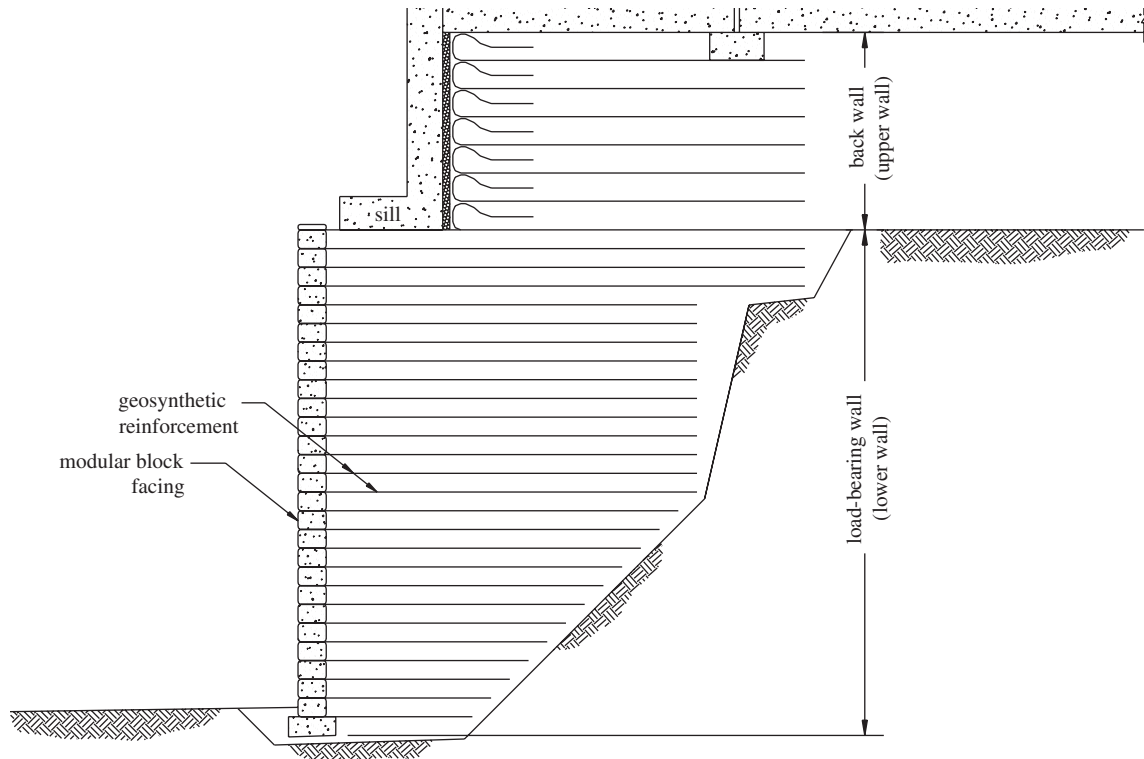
Typical GRS bridge abutment with a segmental concrete block facing.
